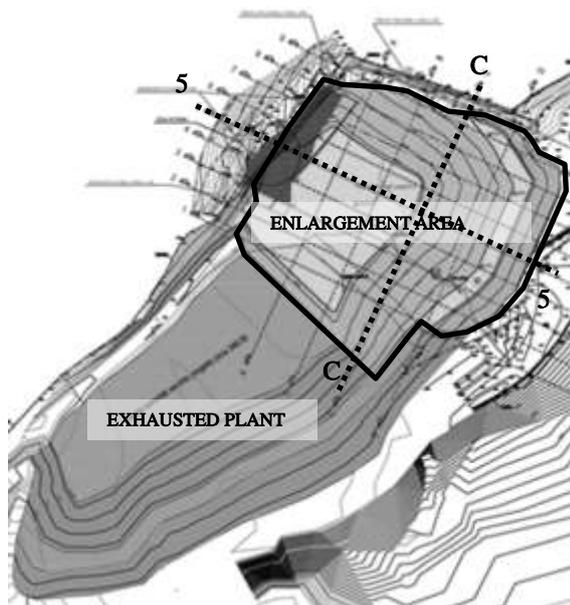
Plan view of the (nearly) full plant and planned enlargement
